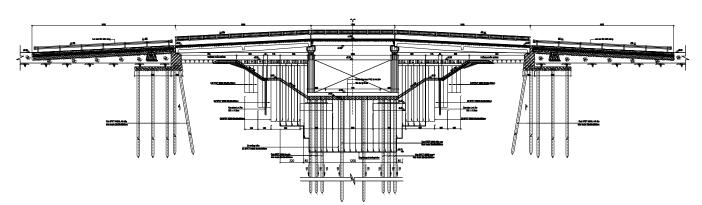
Horizontal section of sluice gate b = 10m combined with traffic bridge HL93
